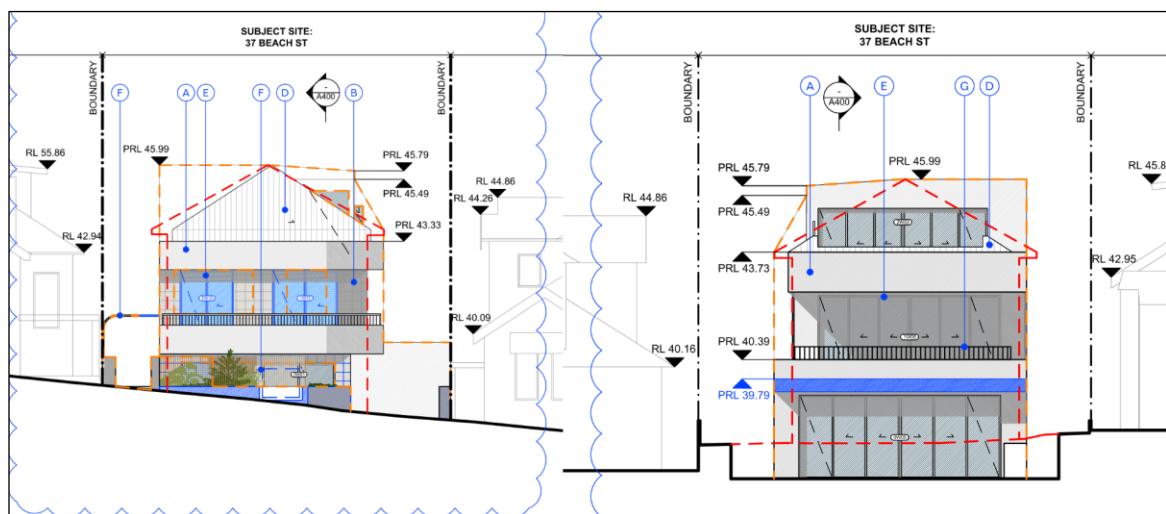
Proposed east (left) & west (right) elevations (source: Common Office, dated 5/11/2025)
